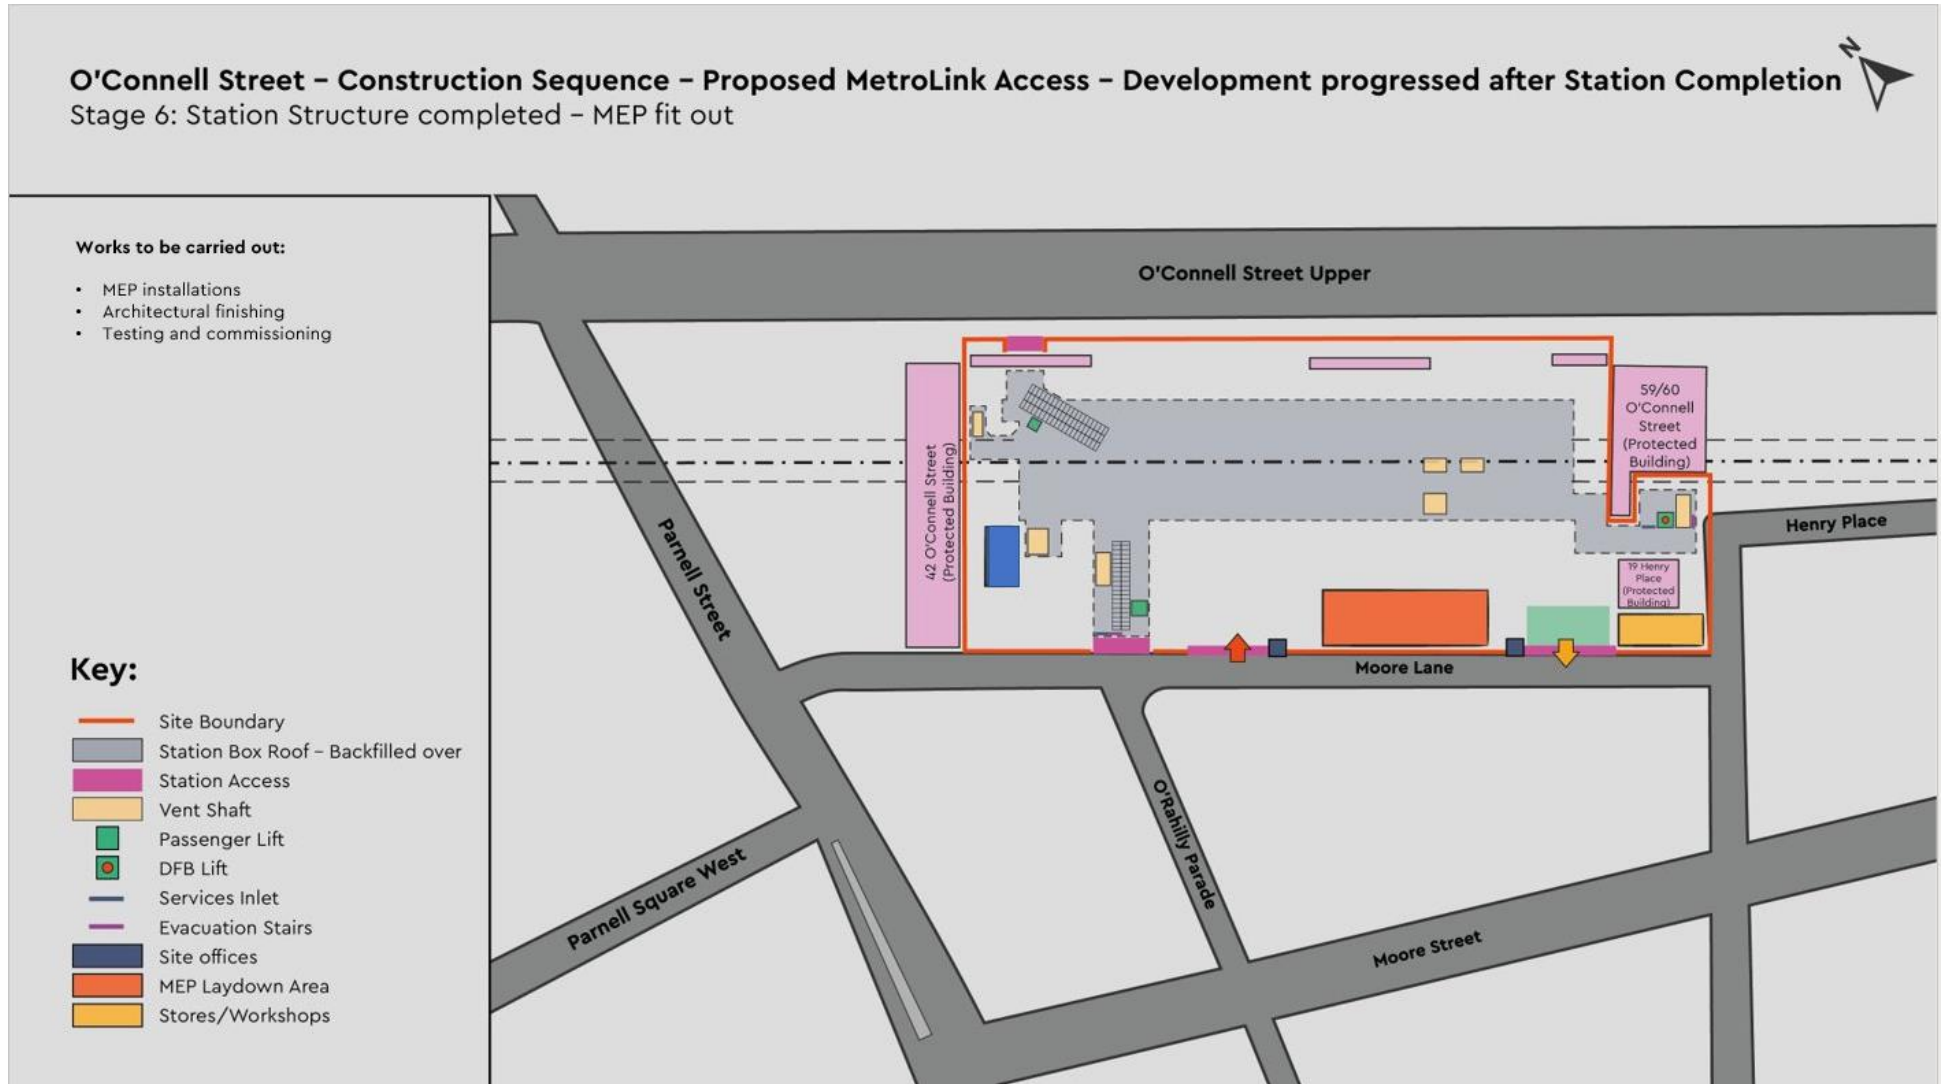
O'Connell Street Stage 6 - Station structure completed - MEP fit out
